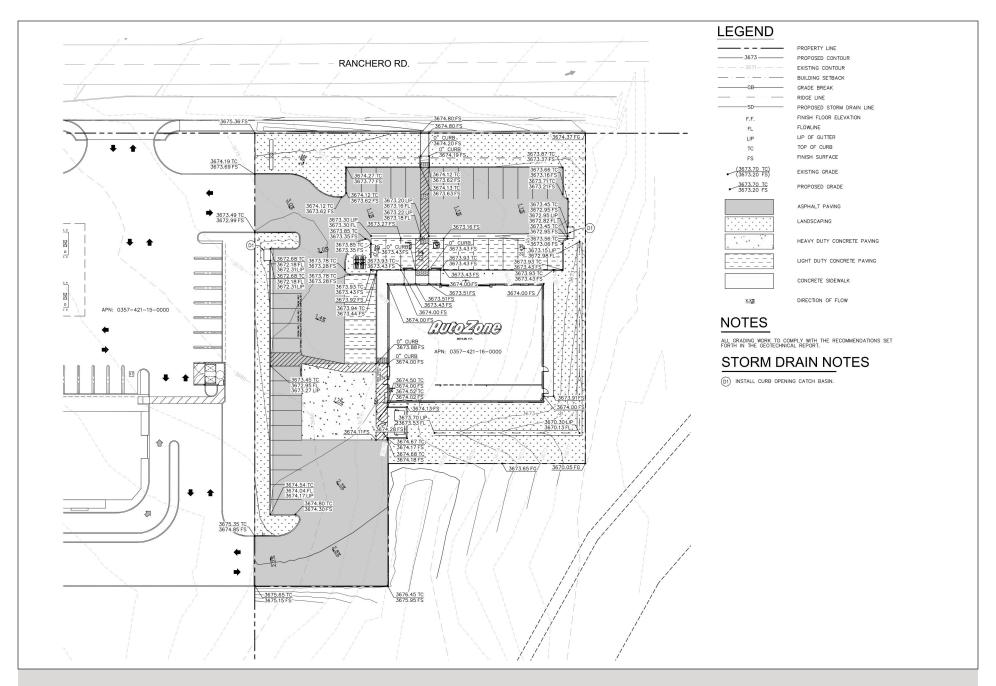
Conceptual Grading and Drainage PlanOak Hills Autozone Project
